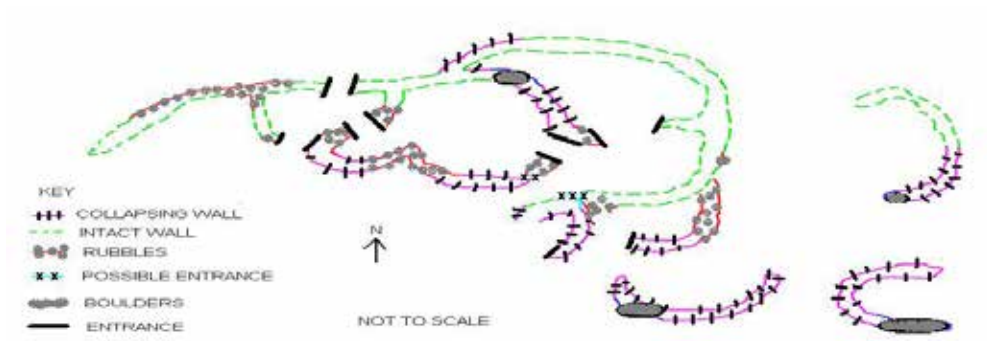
The drawings of Enclosure 2 spatial layout (drawings by Thabeng 2011)
